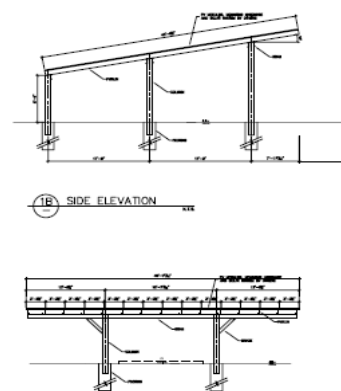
Parking Structure Cross Section view of installation for Solar PV
